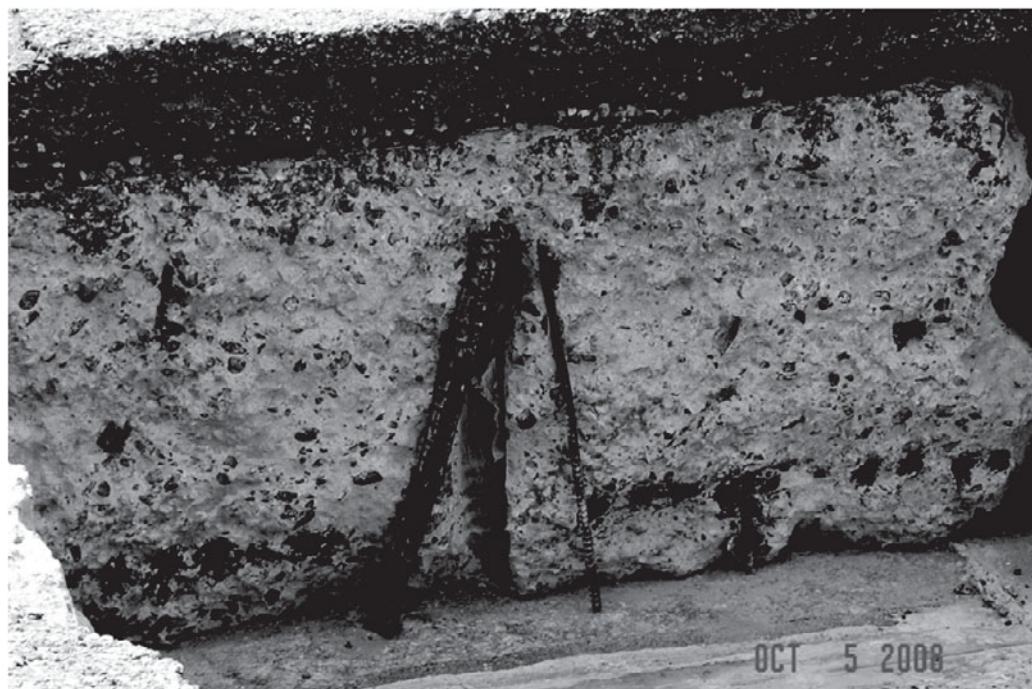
Illustration of bond failure between filler beam and bridge pier dowels
